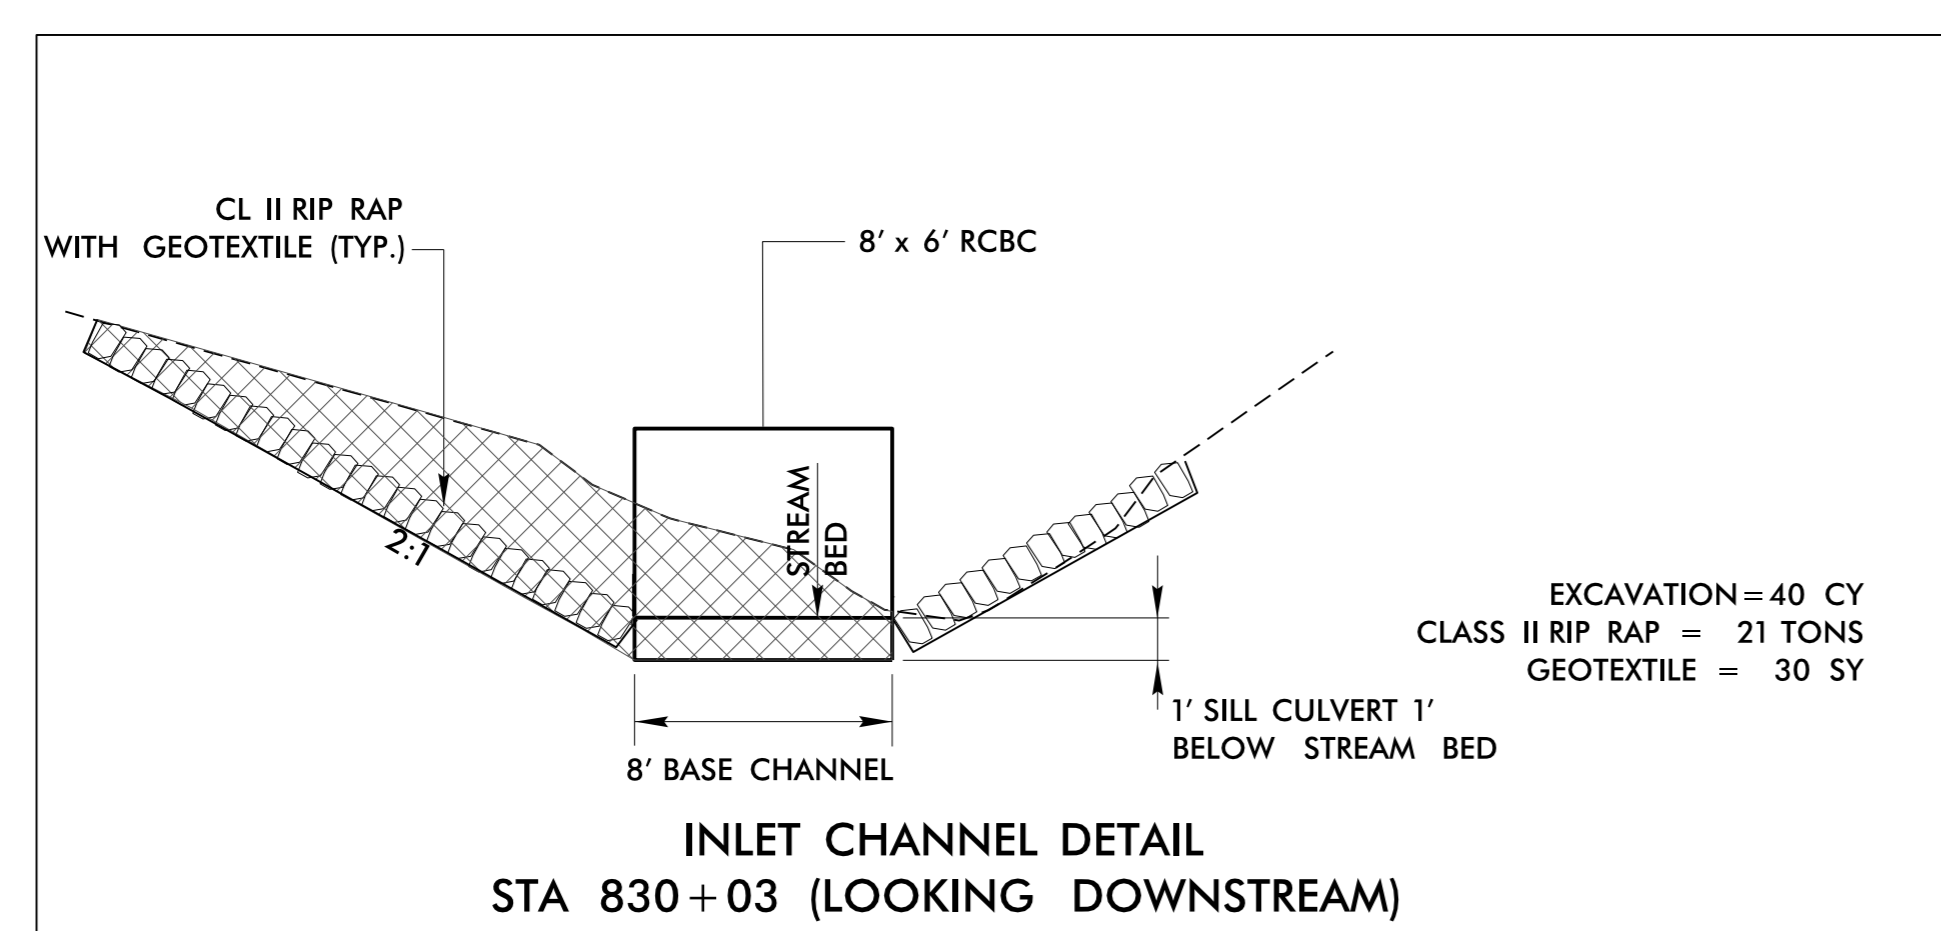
FLOODPLAIN BENCH INLET CHANNEL DETAIL
